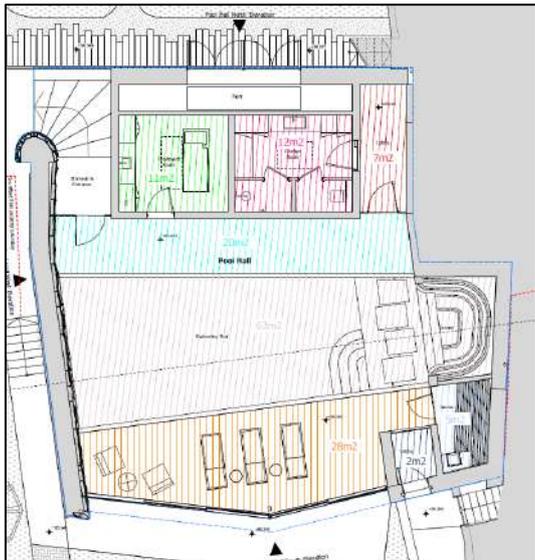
Annotated proposed ground floor plan at 14 Greenaway Gardens
